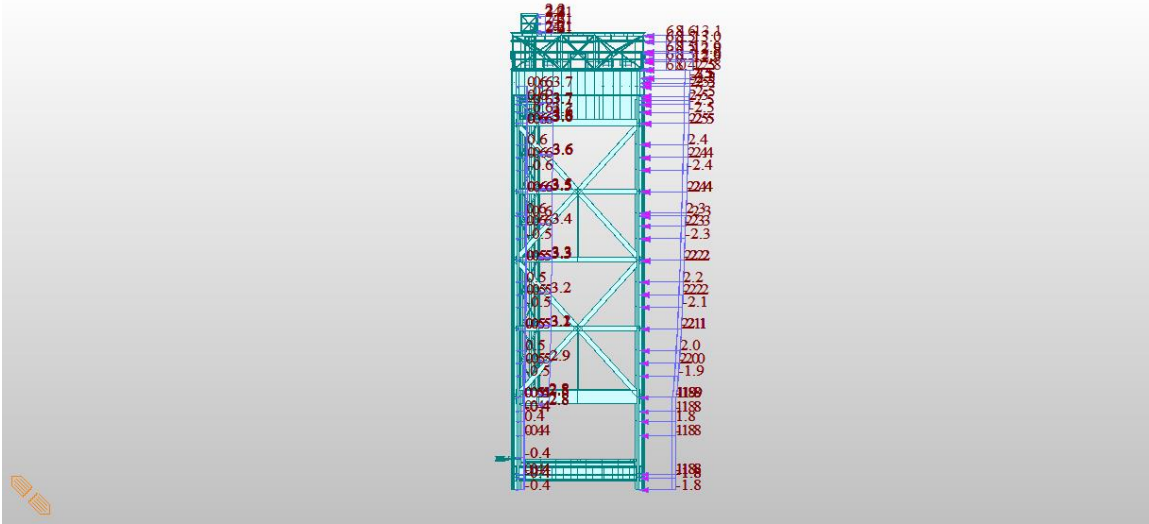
Wind Load Horizontal 1 (East to West) – Tower
